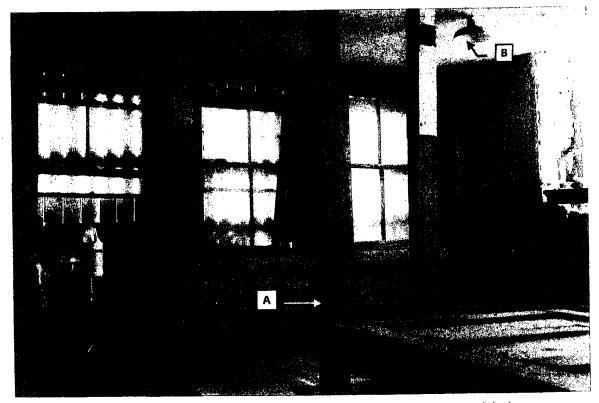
Room 1 view east. (A) Shoring pier per 2003 structural retrofit, (B) Non-historic metal shade.
